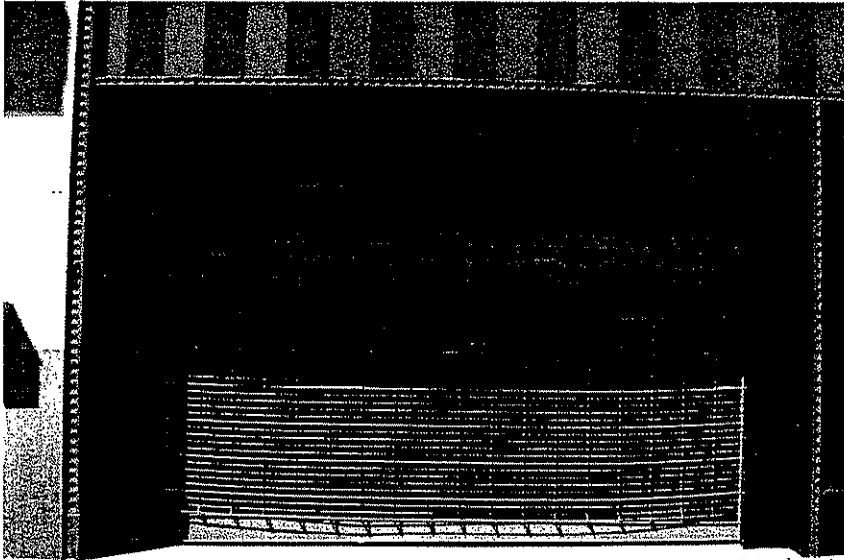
Photo G: Entrance to garage off storefront. Security gate is set back from the plan of the façade to minimize visibility.
